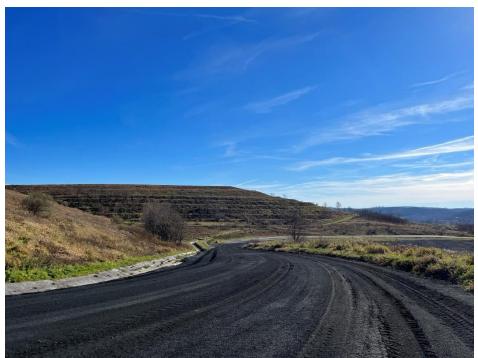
Foreground – Stage 1 west facing benches and leachate pipe cleanout. Background – Stage III west facing benches.
